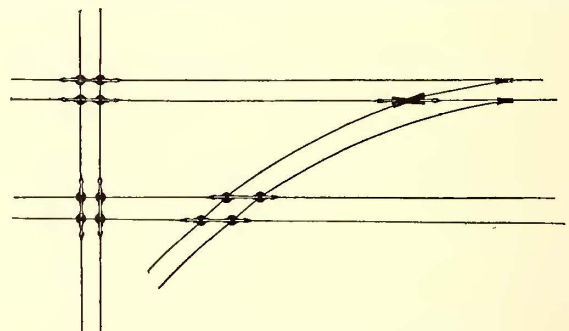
PLAN OF WIRING AT CROSSINGS.
